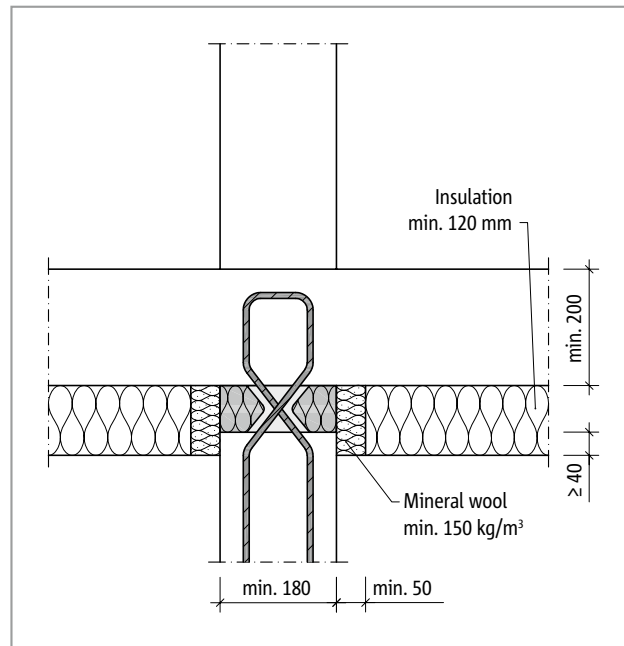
Schöck Sconnex® type W: R 120 / EI 120 with internal wall and under-slab insulation
